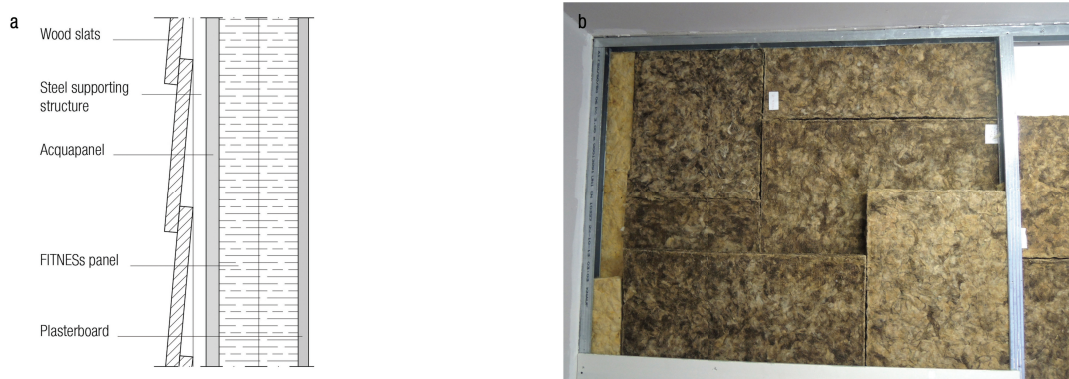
a) Test wall stratigraphy, b) FITNESSs panels installation on the test wall
